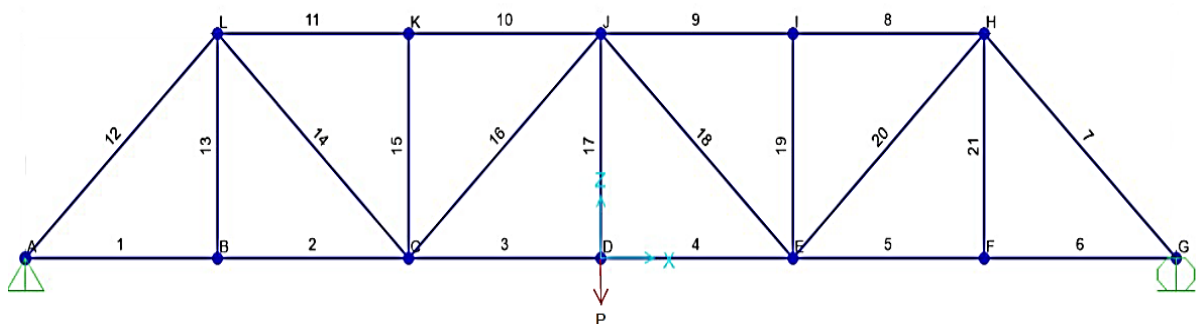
2D truss bridge SAP model, including joints, members and load.
